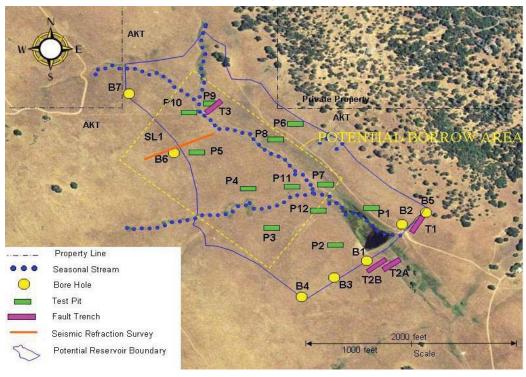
Final Plan for Geological Site Evaluation – El Dorado Hills Site
